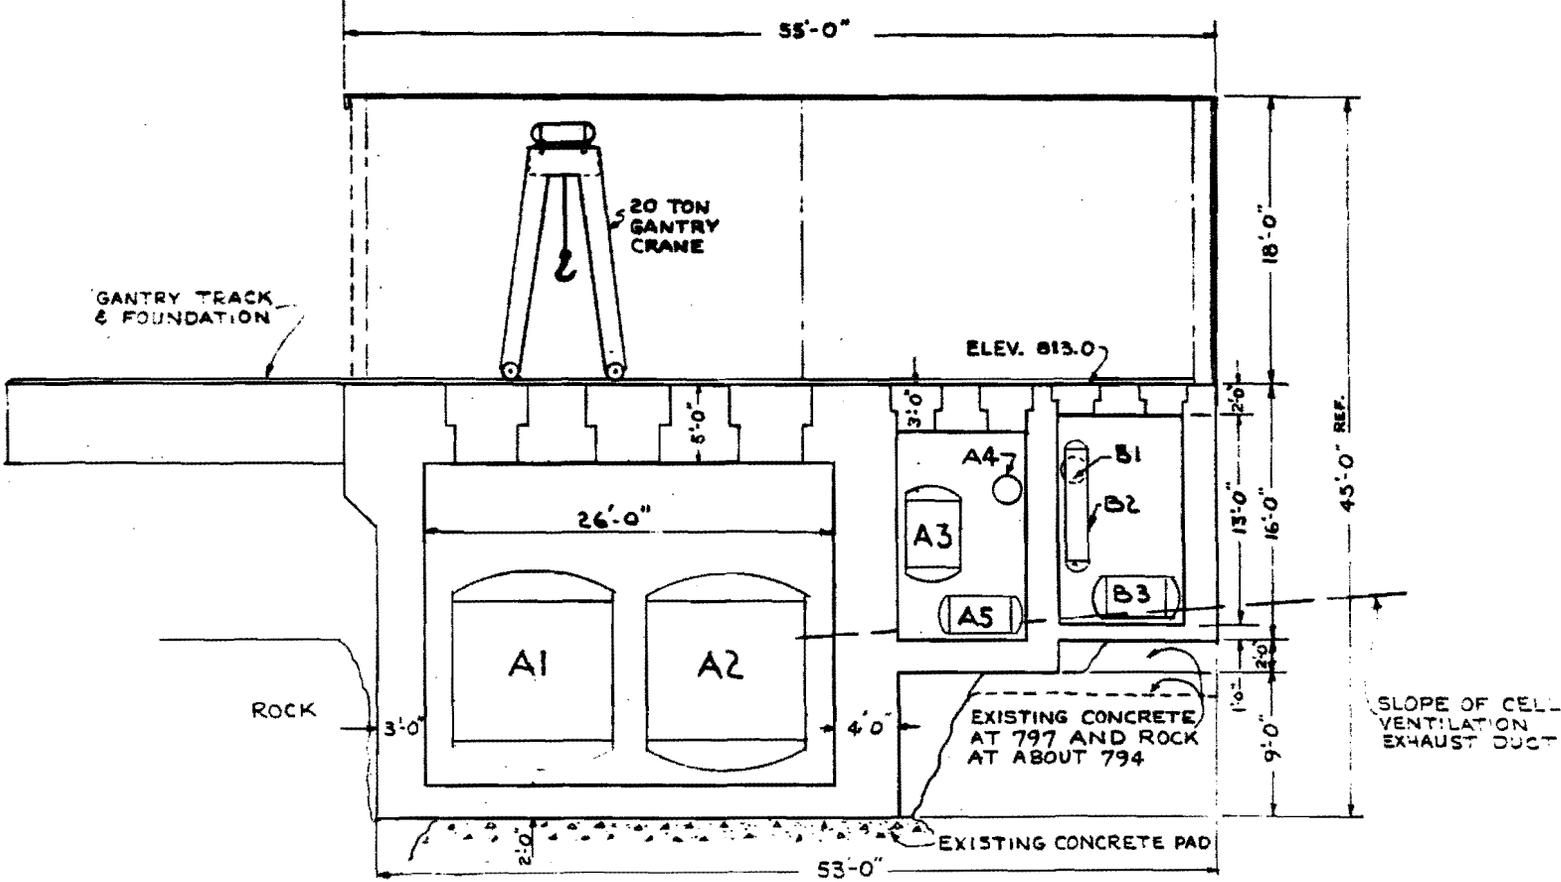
Cross-section and elevation of evaporator, condenser, and off-gas cells.
